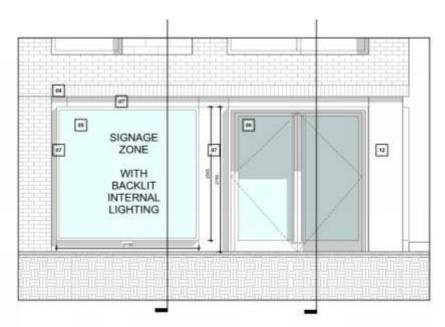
Approved shopfront design of the Castlehaven Road elevation.
